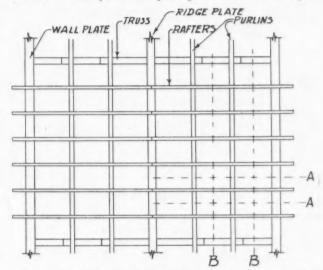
Plan of Roof Showing Load Areas Carried by Rafters and Purlins.
